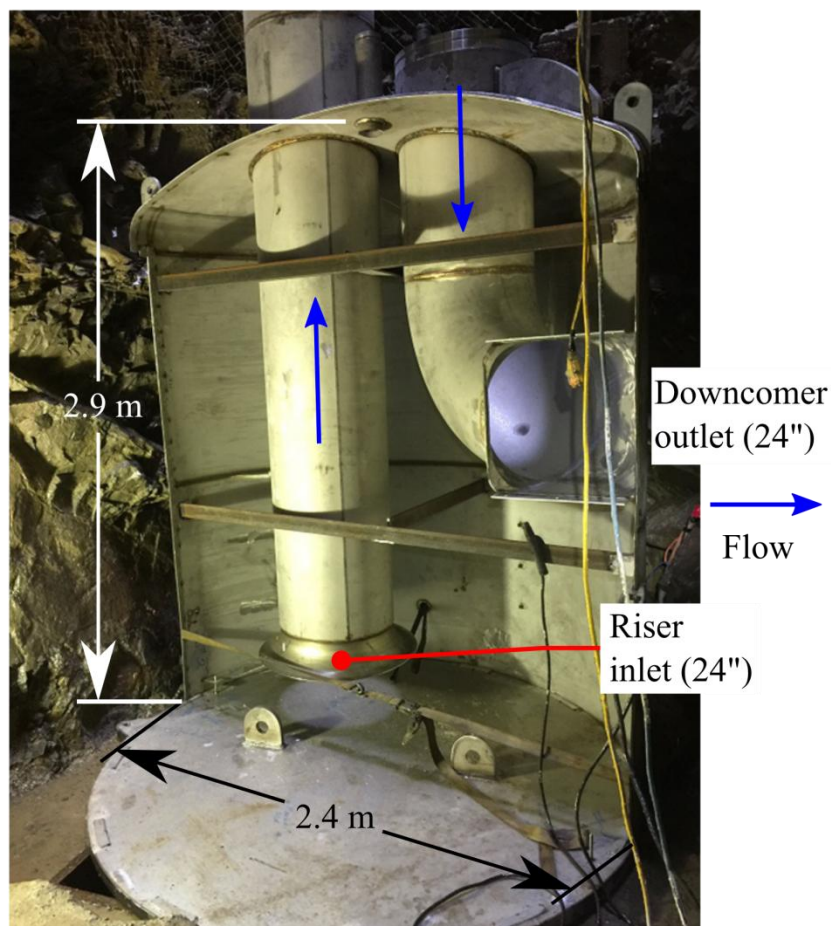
A cutaway view of the separator during reassembly at shaft bottom prior to the third piece of the assembly was lowered into place (Electrale Innovation Limited, 2017)
